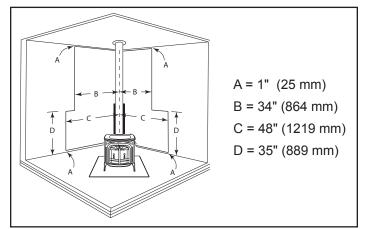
Corner installation, vertical chimney connector, with rear, stove, connector and wall shields. Wall shields MUST meet at corner. Connector heat shield extends 28" (710mm) above flue collar. A 24" (610mm) diameter ceiling heat shield must surround the chimney and be suspended 1" (25mm) from ceiling.
